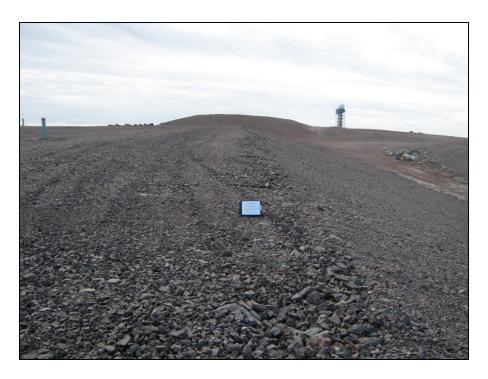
A. Northwest corner of landfill facing east along crest. ____ ↑
